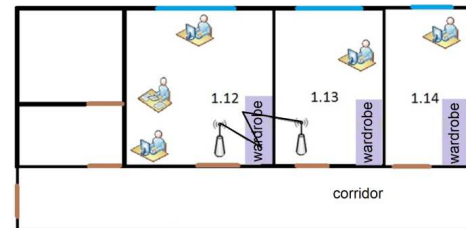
Section of building with the marked first measuring position. Measurement of attenuation between room 1.12 and room 1.13.
